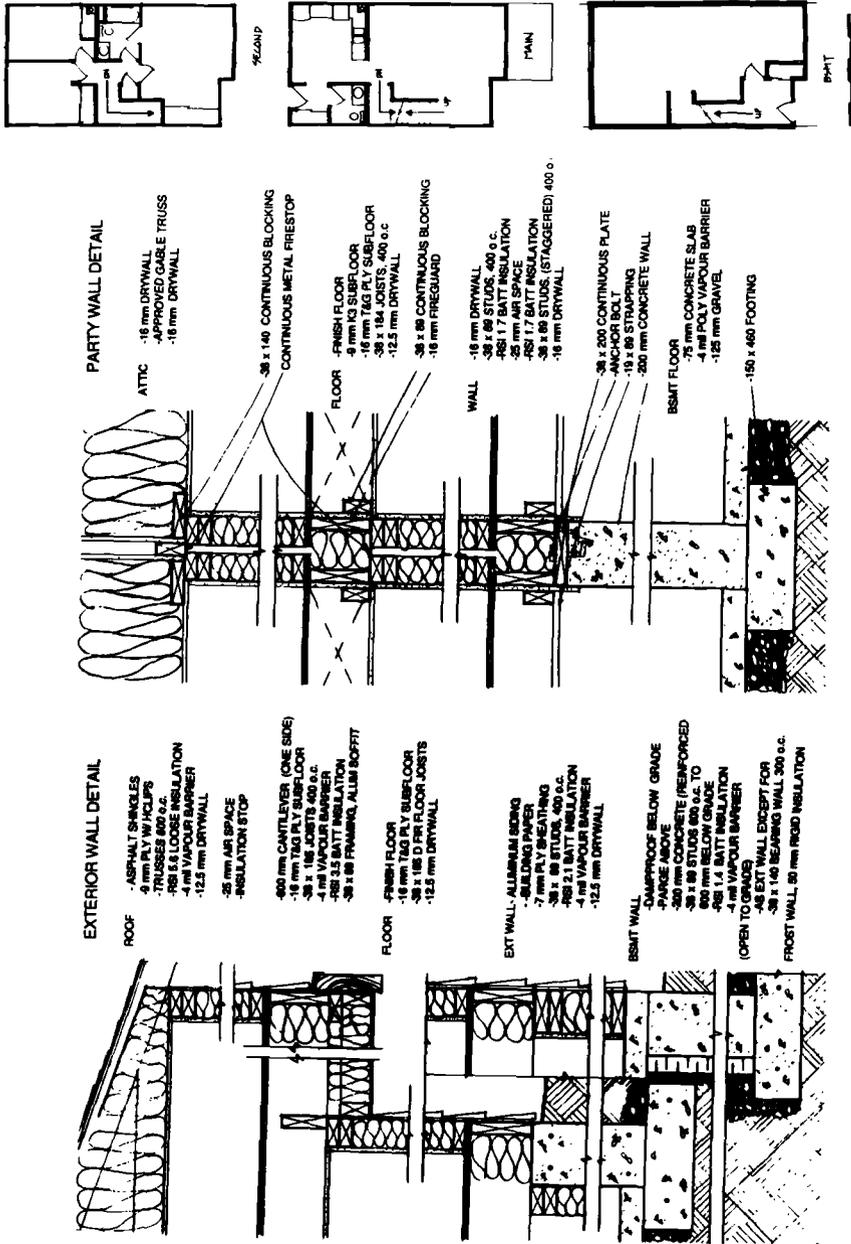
Exterior wall section, party wall section, and floor plans for Project 7.
